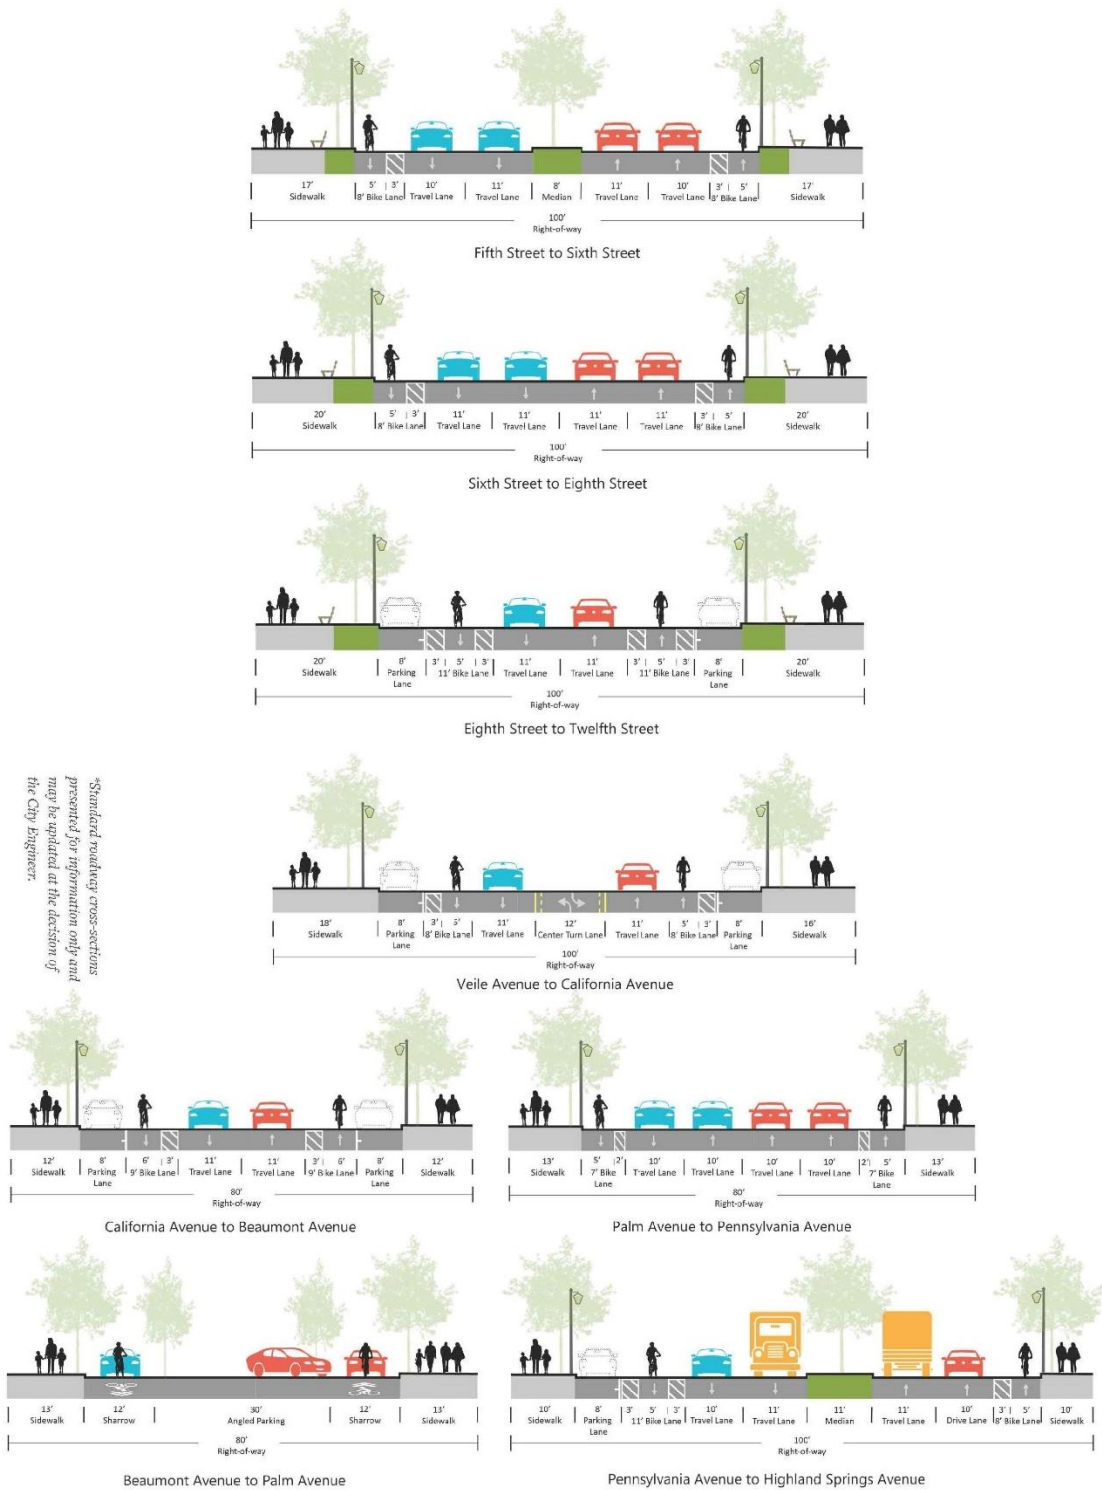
CITY OF BEAUMONT GENERAL PLAN CIRCULATION ELEMENT
